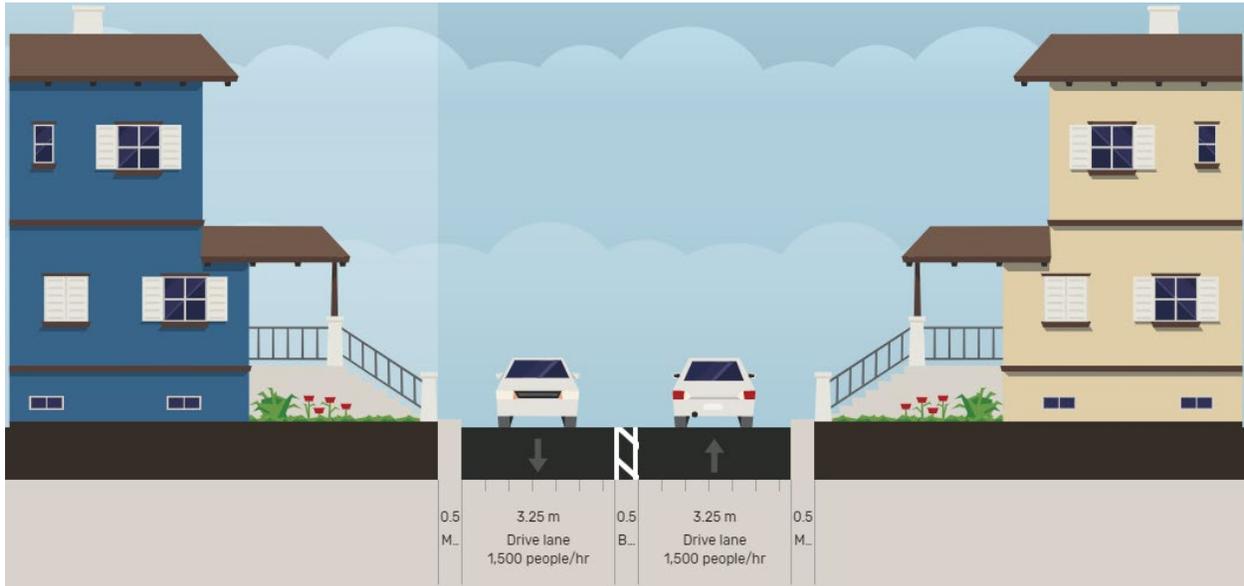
Lake Drive South, North, East: Church Street – Metro Rd North & Coxwell Street – South Drive
